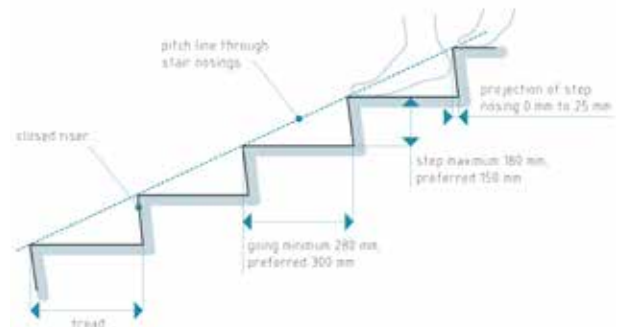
Stairs, in some countries, the nosing and projection must not be used at all (Suláková according to EN 17210:2021)
